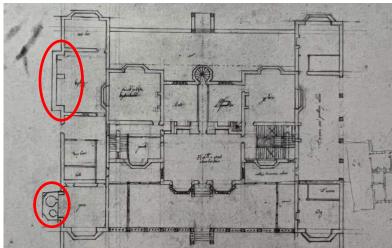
John Thorpe, plan of Holland House, Kensington, showing external thickening of kitchen wall to accommodate fireplace & ovens (Jummerson).
